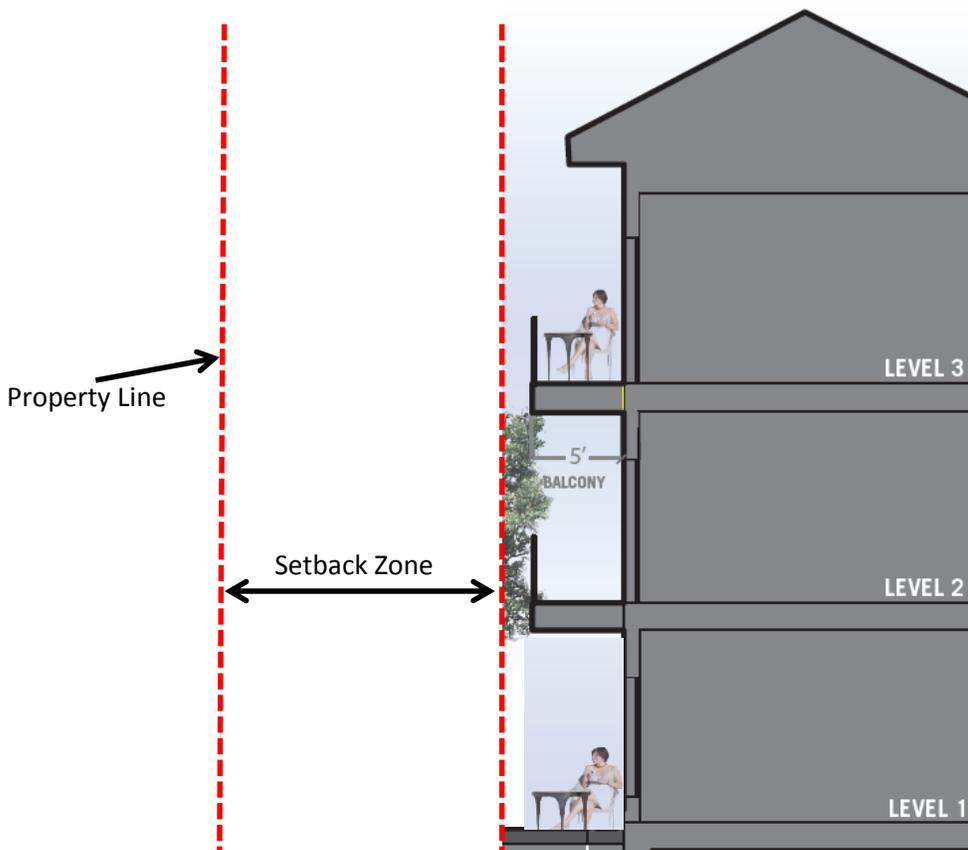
Allowable conceptual design for upper level balconies not integrated into building façade. Note that balconies must be outside of Setback Zones.
